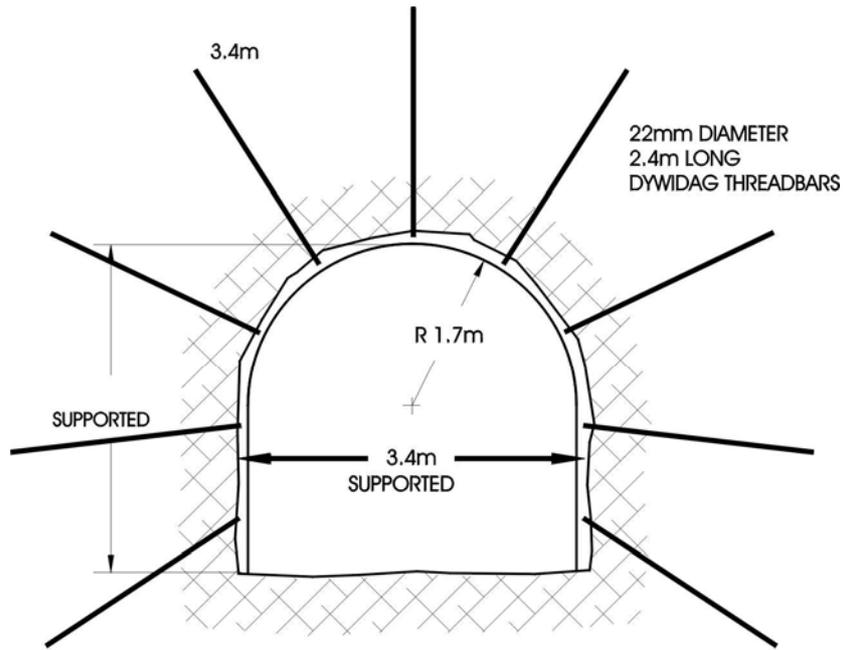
Initial reinforced shotcrete had to be slashed to increase the size of the tunnel in order to fit arches.
